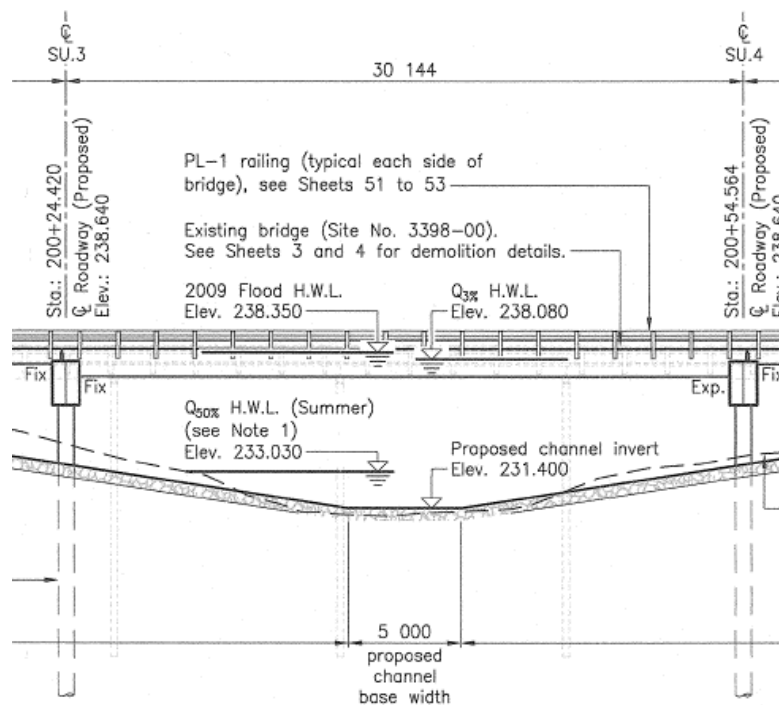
Little Morris River Bridge Centre Span General Elevation (*WSP 2018*)
